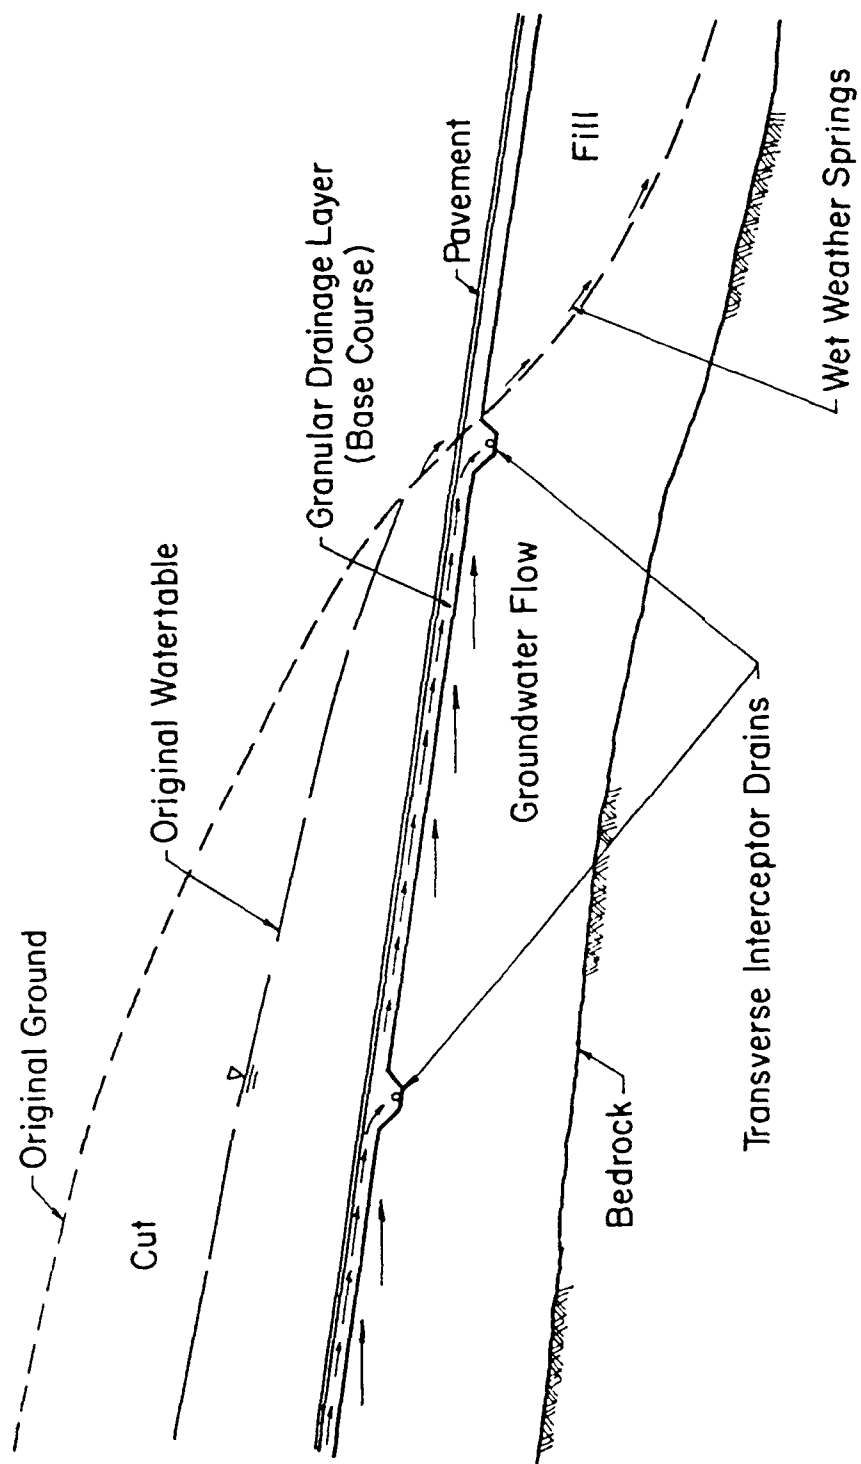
Transverse Pavement Subsurface Drainage System (Ref. 1).
